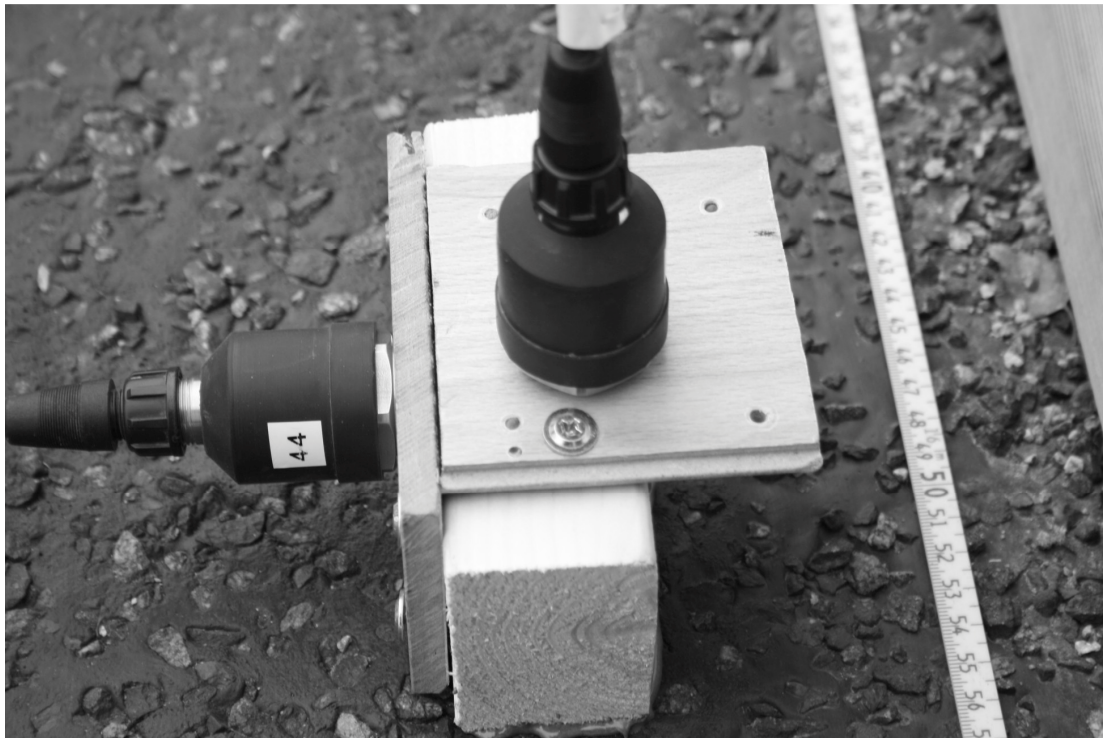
Connection between the accelerometers and the box-beam bridge. The bottom of the piece of wood is glued to the asphalt with "Plastic Padding". Photo: Carl Westerlund
